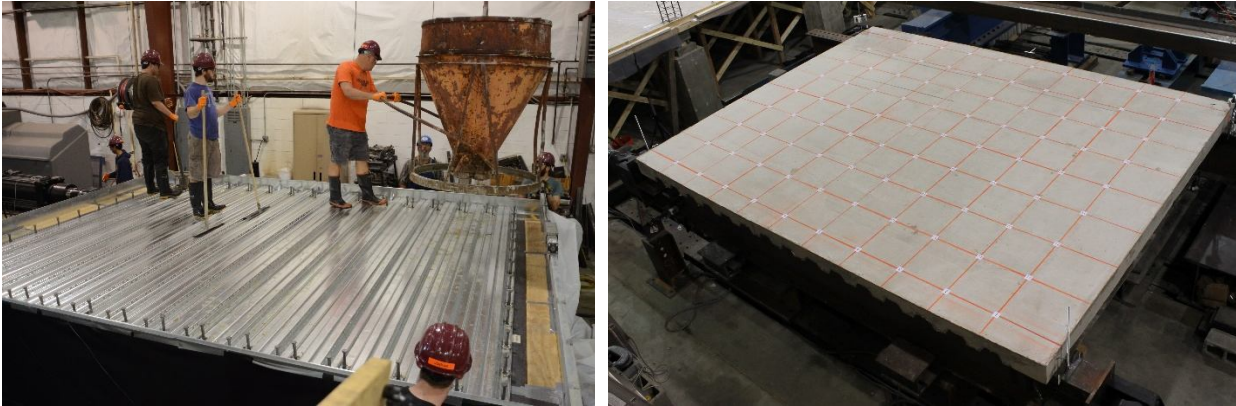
Specimen 3/7.5-4-N-NF-DT Before and After Concrete Placement
